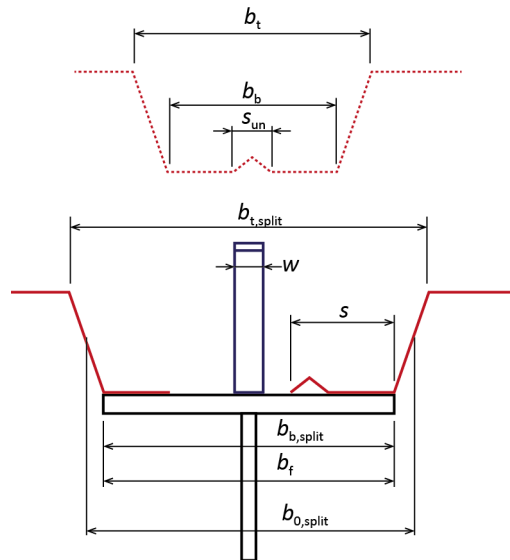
Splitting of a rib with one rib stiffener (one row of parallel connectors).
